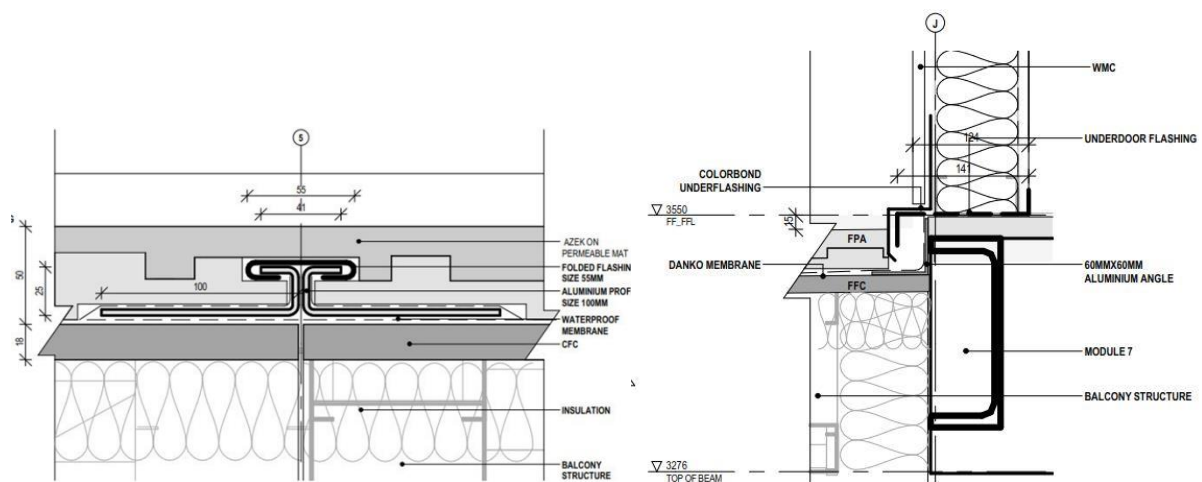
(a) silo flashing as it appears in section view facing up the balcony (b) Return flashing at the top of the balcony where the intersection waterproofs the first floor modules with the ground floor modules
